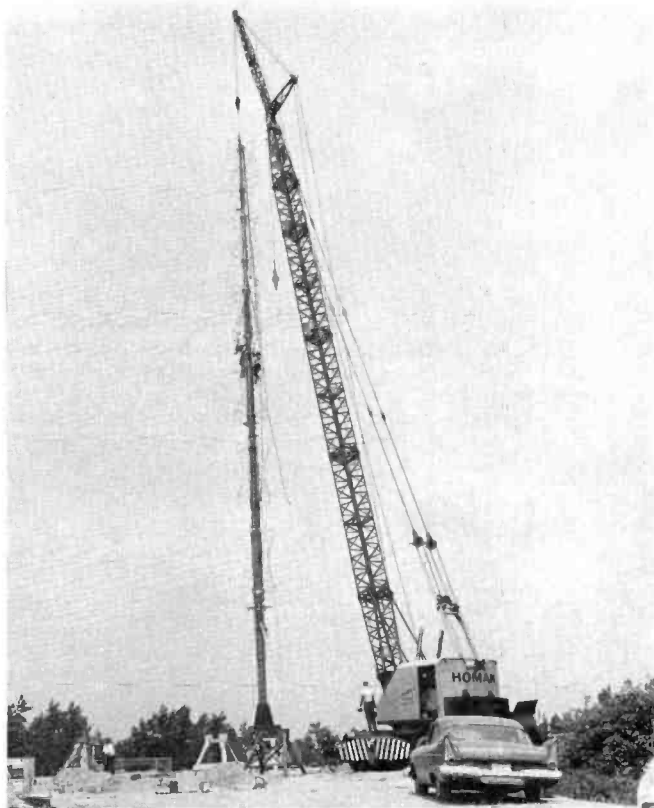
Six-section S-T shown being set up for testing prior to erection in Dallas to serve Ch 5 WBAP and Ch 4 KRLD.
